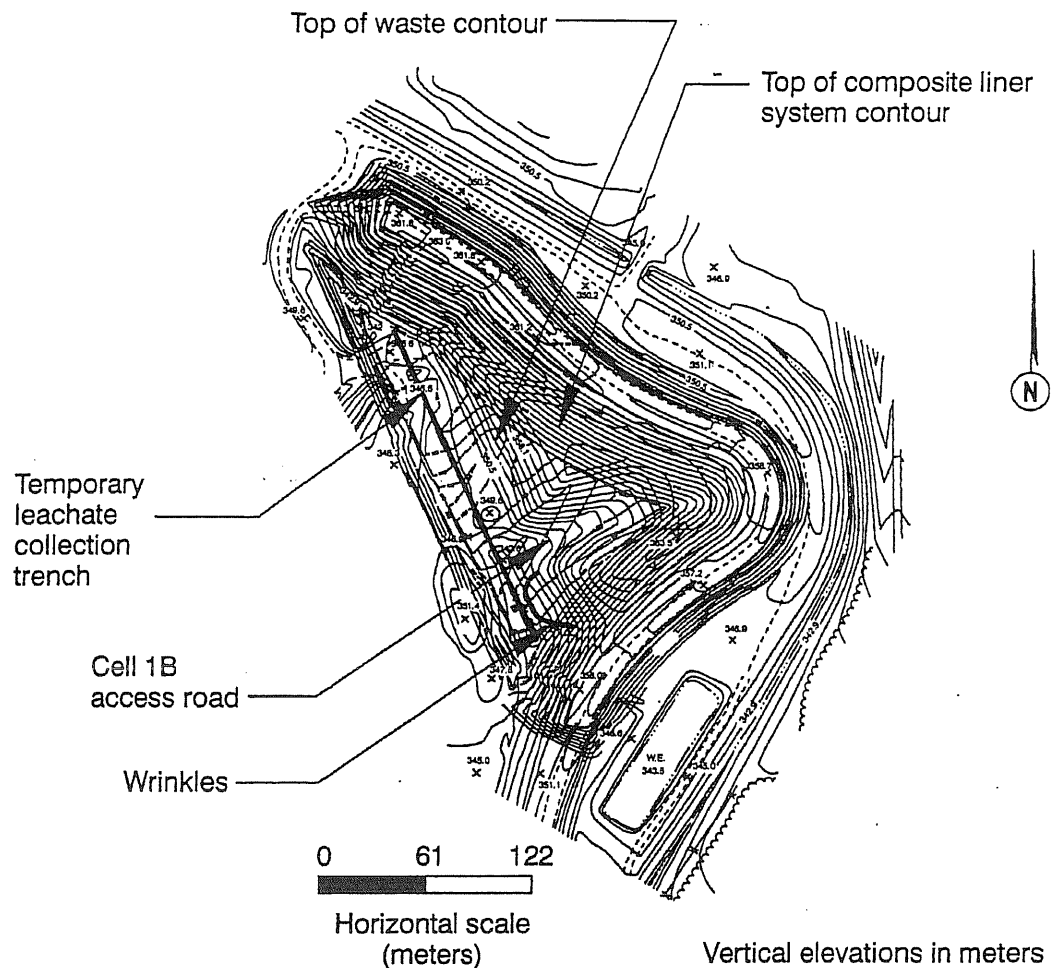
Access road and estimated surface elevations in Cell 1 at time of failure.
